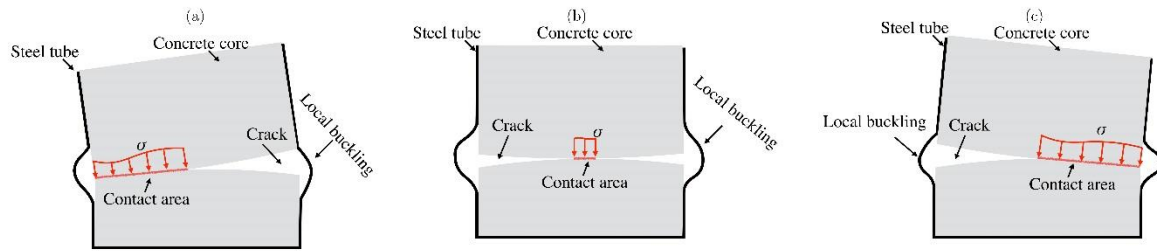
Concrete cracking of circular CFST under large deformation
